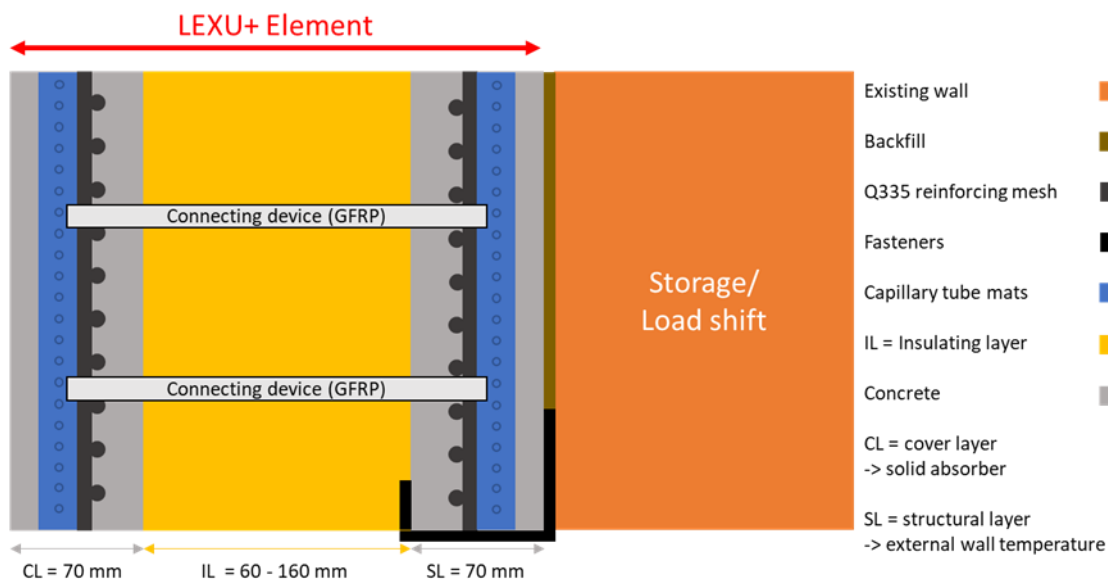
Cross-sectional view of the sandwich façade element implemented in LEXU+. (SL = structural layer & CL = cover layer). Source: Karsten Rauber, IZES gGmbH
